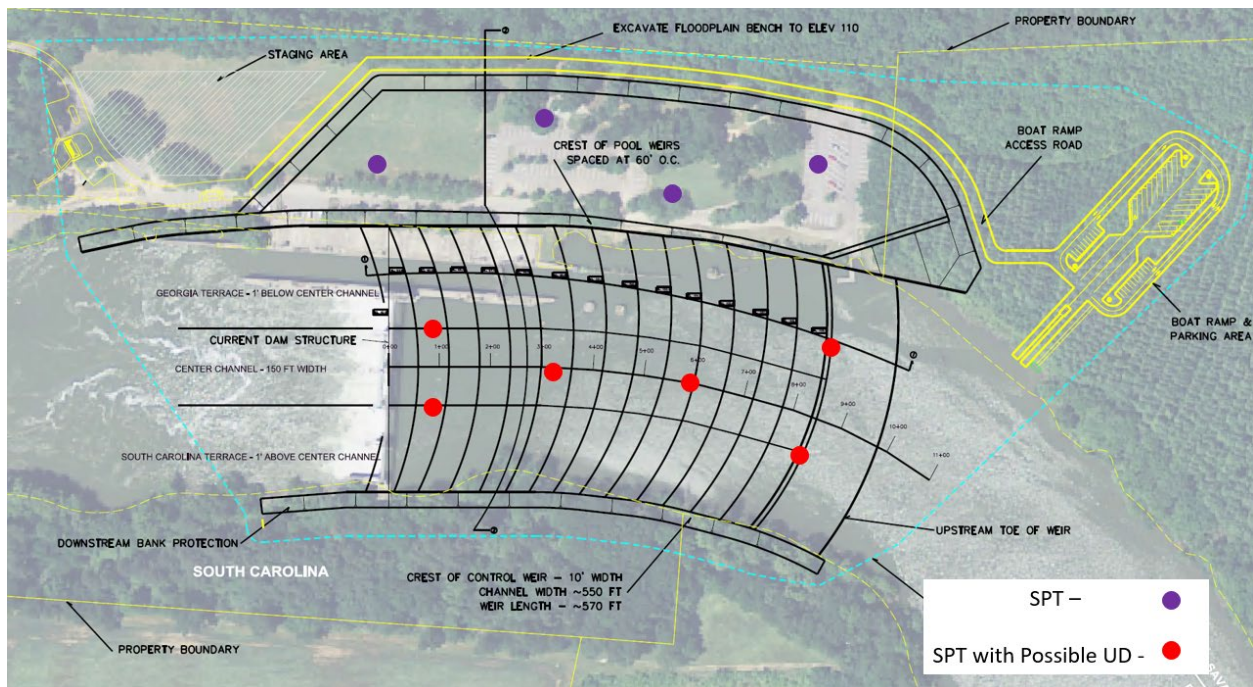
Plan View of Proposed Additional Explorations for Fish Passage Design
